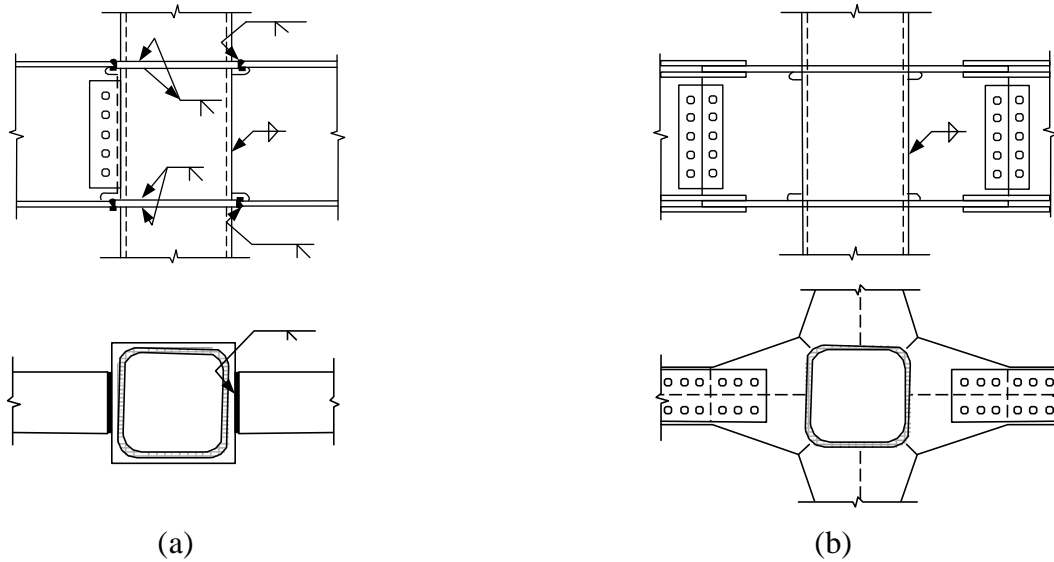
Beam-to-column connections: (a) Through diaphragm, (b) Exterior diaphragm
